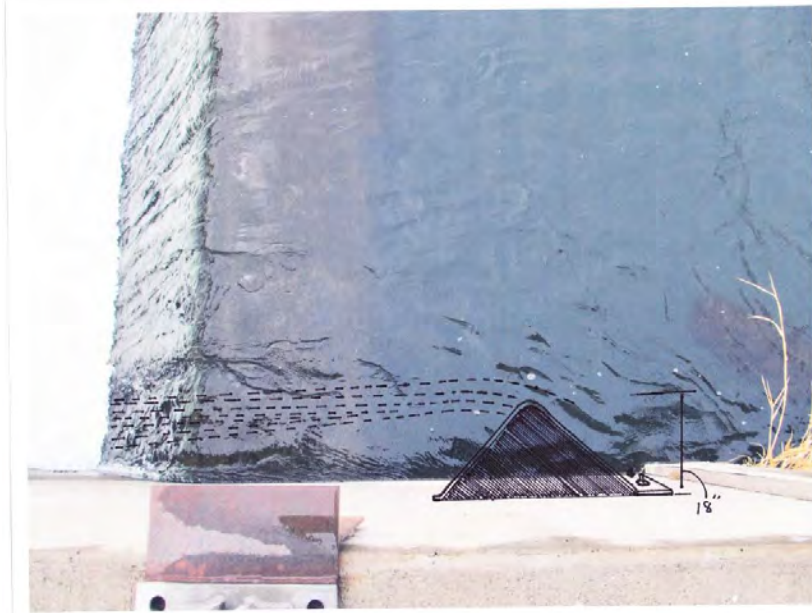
A photo with an engineer drawing depicting a new deflector placed 1.5-2 feet upstream of the spill on the west side of the central ladder, potentially enabling adult lamprey to climb the dam successfully by creating a gentler flow just downstream in the spillway. This structure would be one of the most inexpensive fixes among all the designs contemplated. This structure can be initially tried on the right bank spillway.
